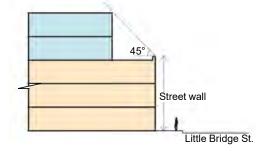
Approach to upper level setback along Little Bridge Street and Curtis Street
